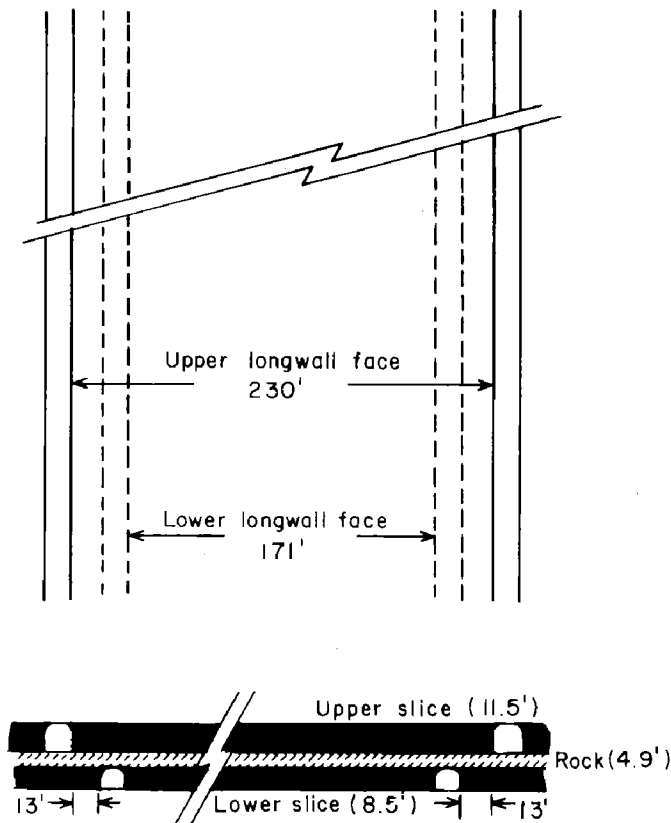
Multislice longwall face layout in Kushiro mine.
